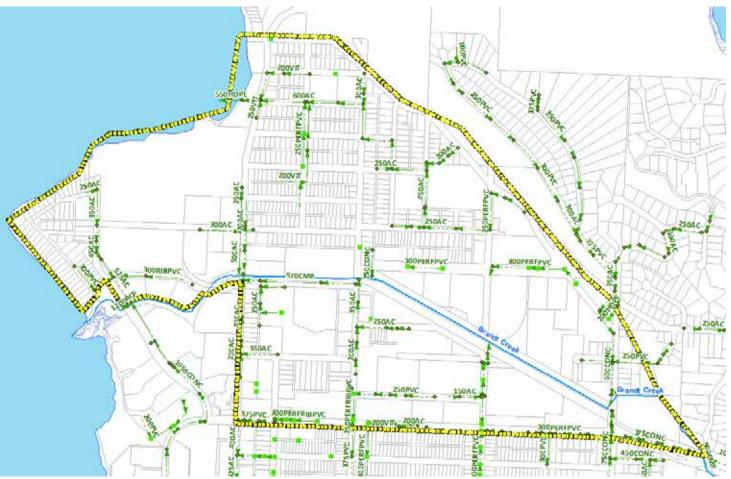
North End Existing Stormwater Sewer Collection System by Age
